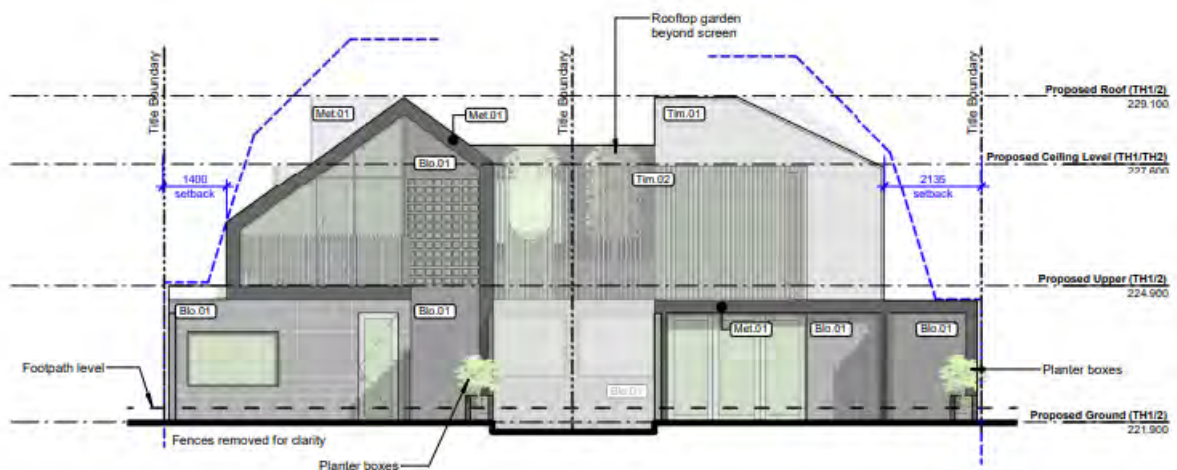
South west (Williamson Street) elevation for Dwellings 1 & 2
